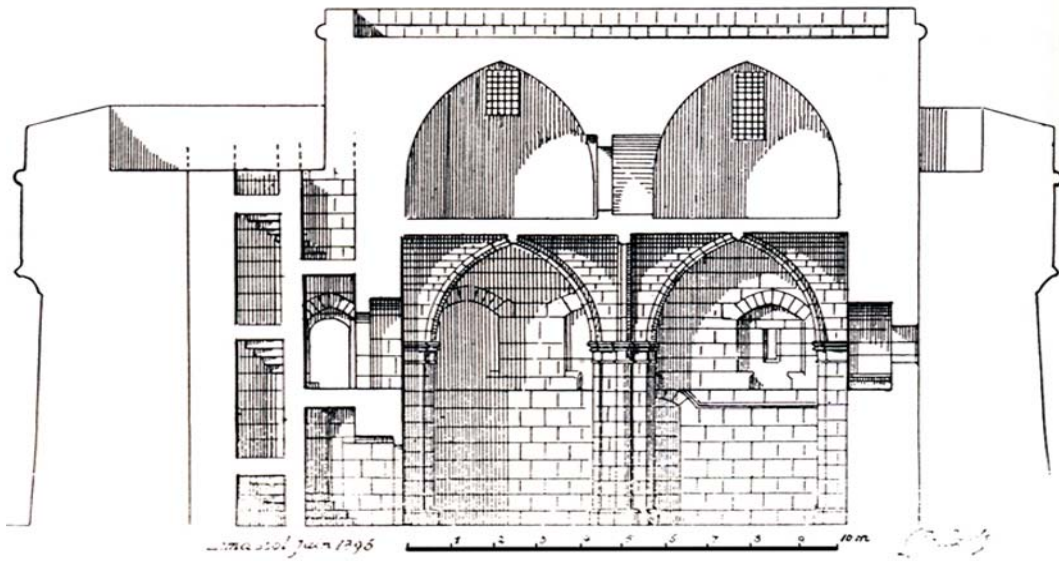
Section Through The Chapel, Hall With Vaulted Ceiling.
